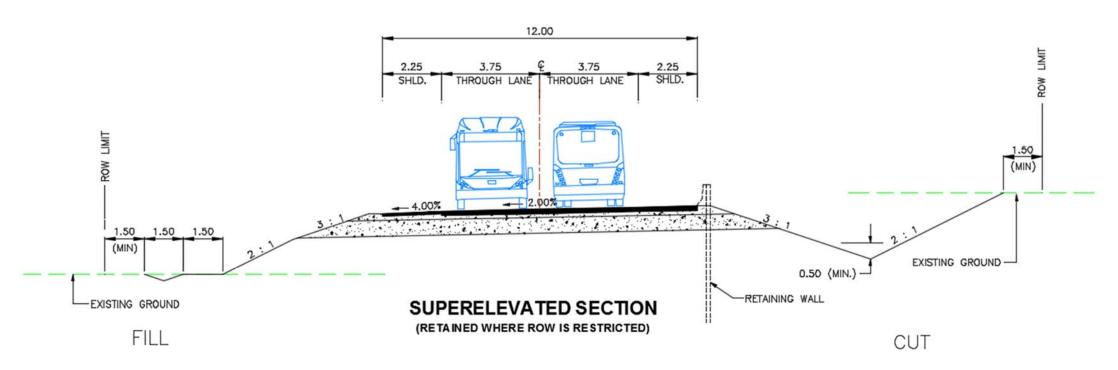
SUPERELEVATED SECTION BETWEEN STATIONS
